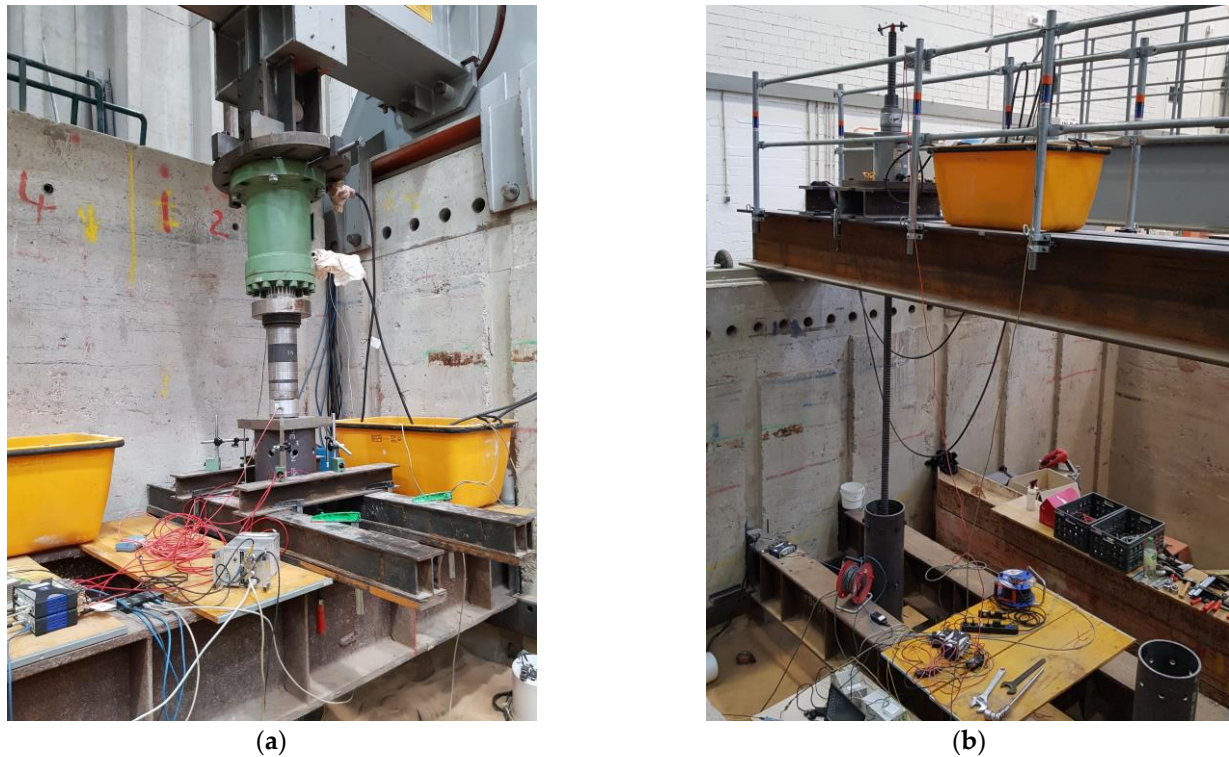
Setup of static pile load tests: (a) compression test and (b) tension test.
